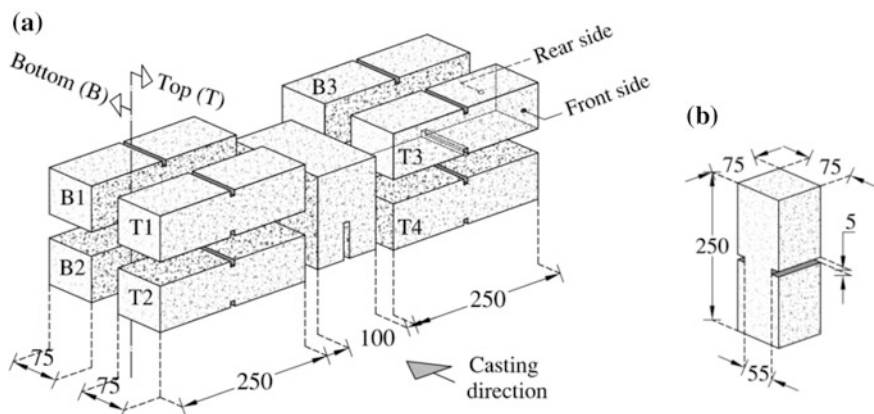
a Extracting process of direct tensile specimens from tested 3PNBBT; b Typical tensile specimen (dimensions in mm) (Salehian and Barros 2015)
